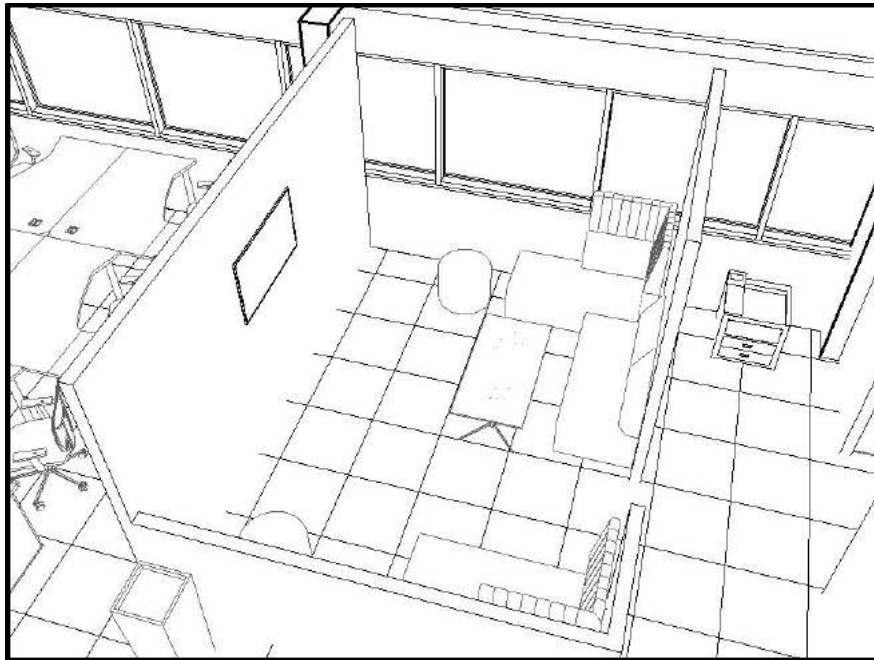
Typical Informal Meeting Area Layout – 3D
